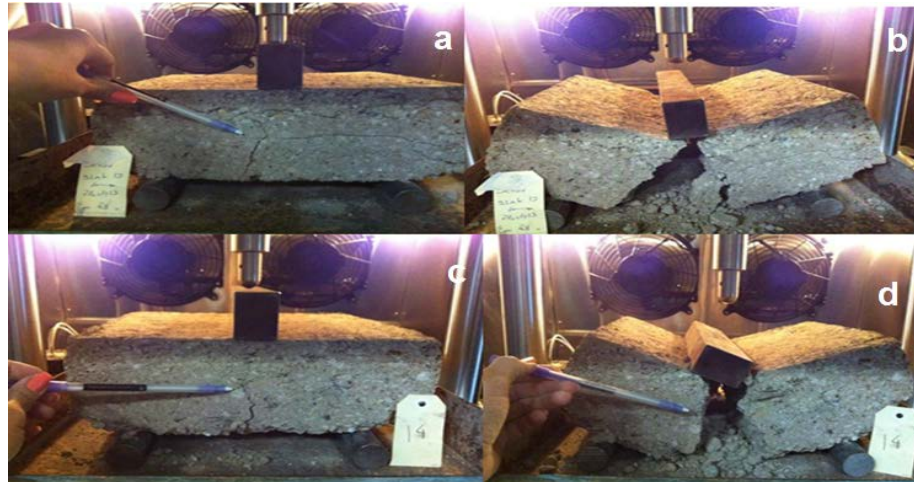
Modified bending beam test with roller .(a) Increase of cracks with rise of applying loads.(b) Failure of RCC beam (c) Increase of cracks with rise of applying loads (d)Failure of RCC beam
